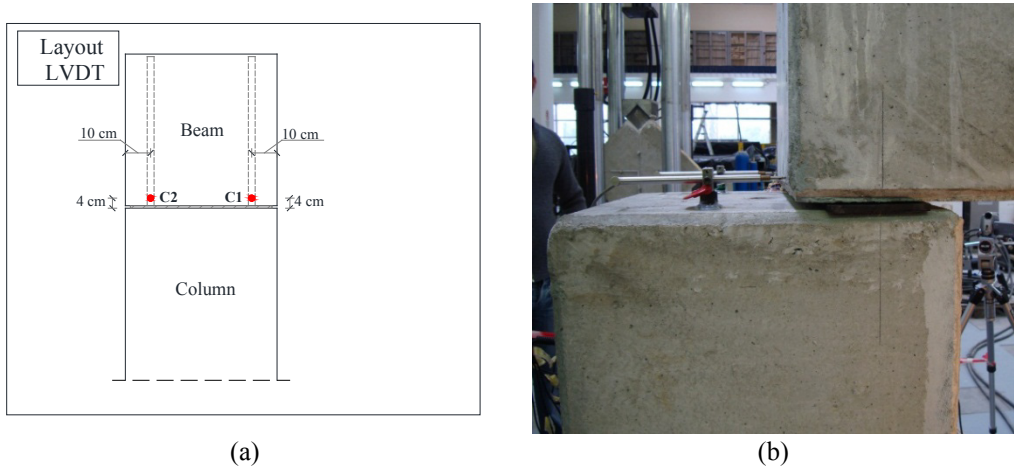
Layout of LVDT to record relative displacements between the beam and the column
